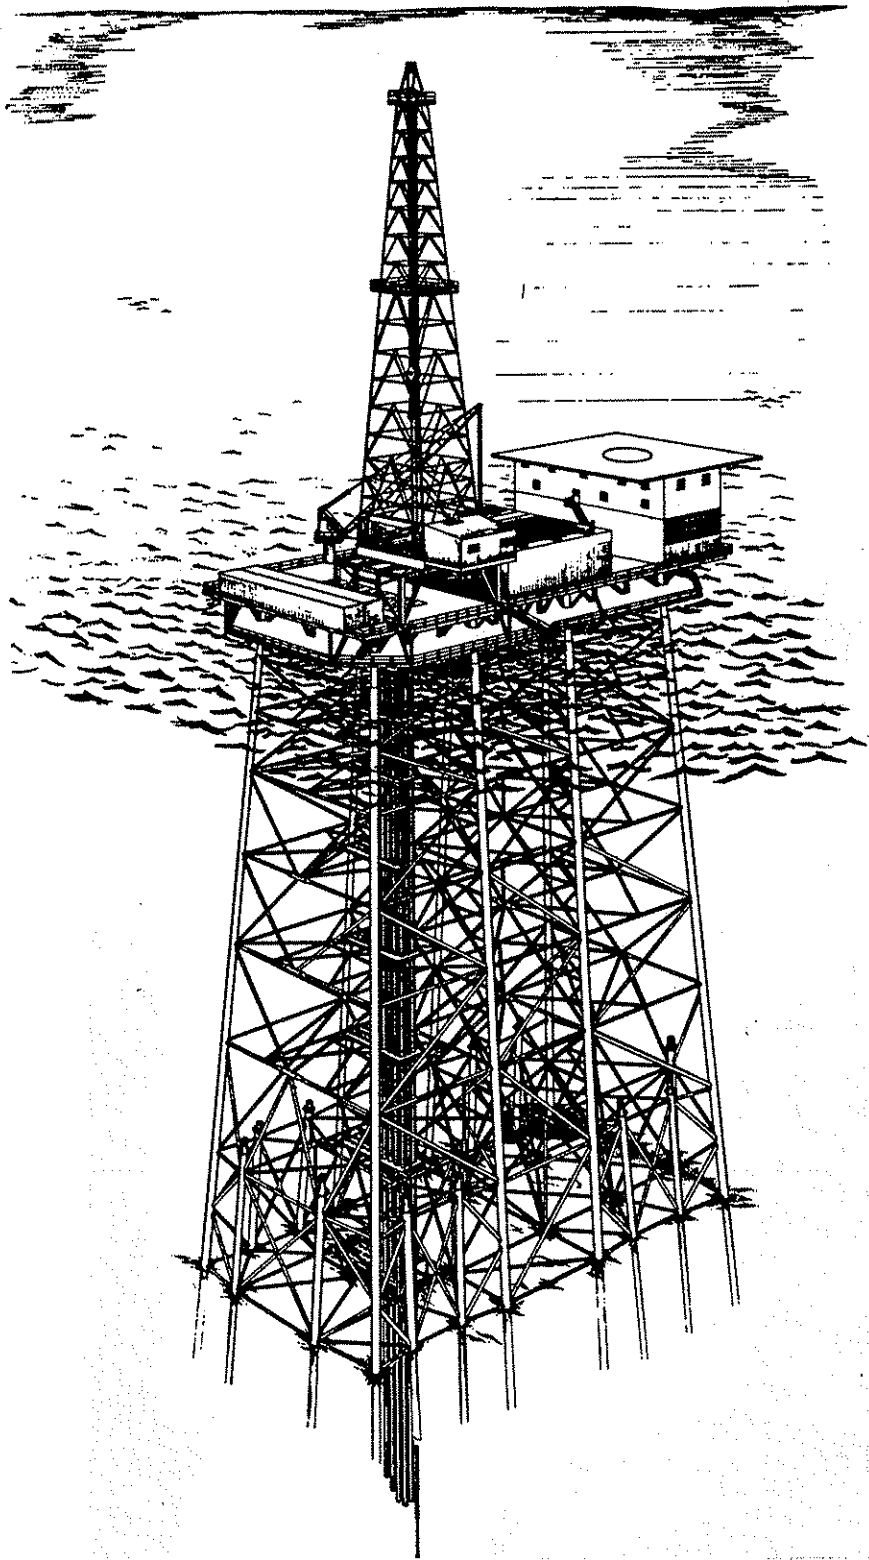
Sketch of a typical offshore platform steel jacket showing structural members above and below waterline.
